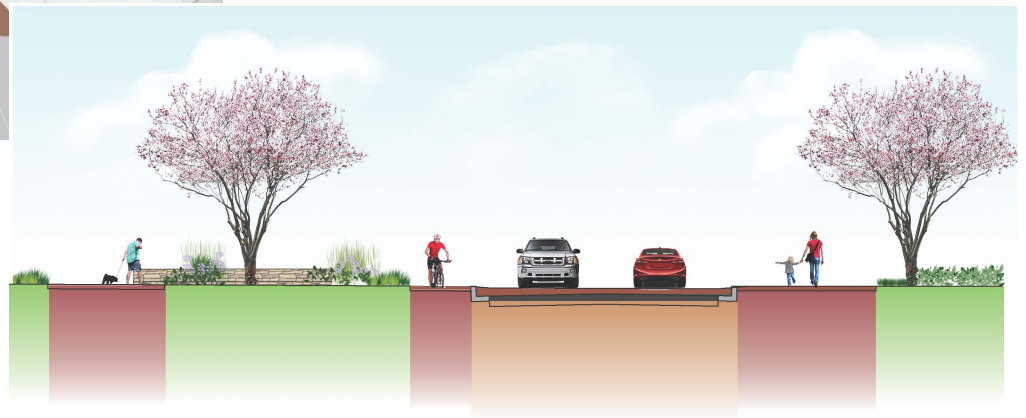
West Market Gateway with crosswalk and sidewalk extension leading to the Oakley Cabin Trail to the south and Reddy Branch Stream Valley Park to the north
